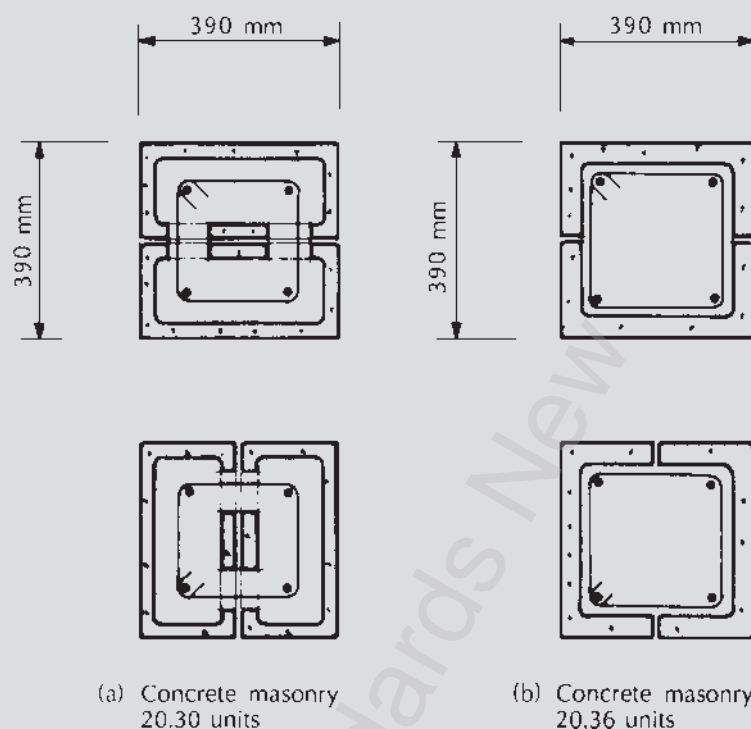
Typical construction of masonry columns showing alternating courses
